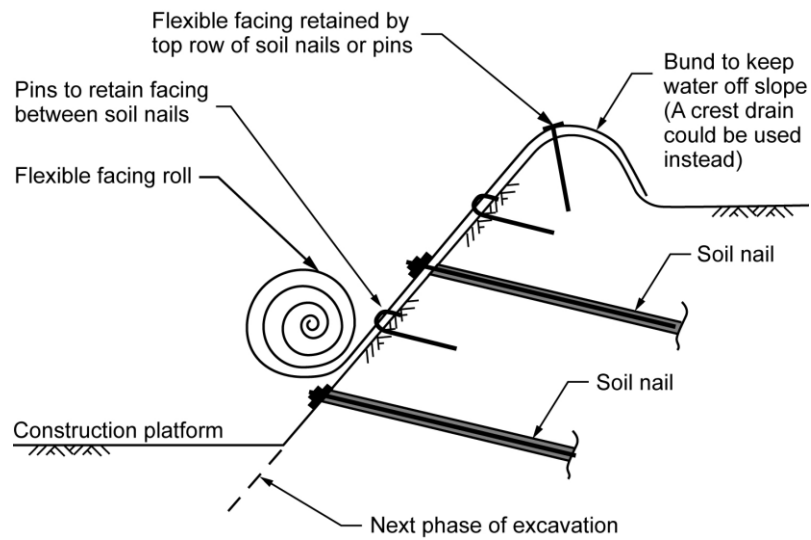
Schematic of the installation of a flexible facing (adapted from Barley et al, 1997a)
